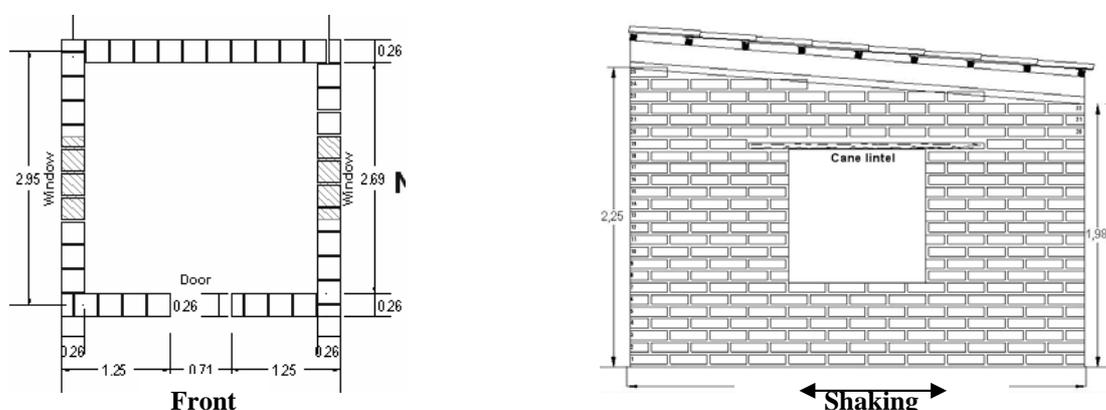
Plan view and elevation of adobe models (Dimensions in m).
